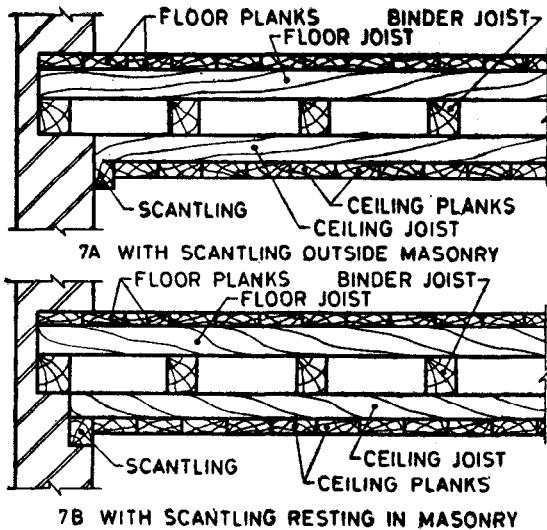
CLOSED CEILING CONNECTING TO BINDERS OF DOUBLE JOISTED FLOORS
